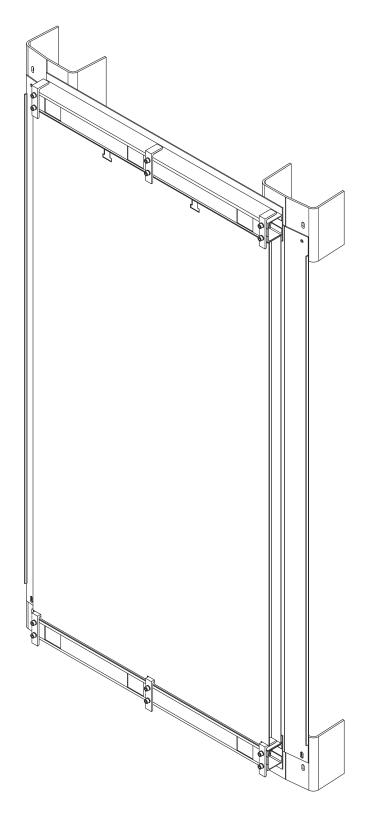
(Sheet 3 of 4) Containment Air Baffle Typical Panel on Cylinder
